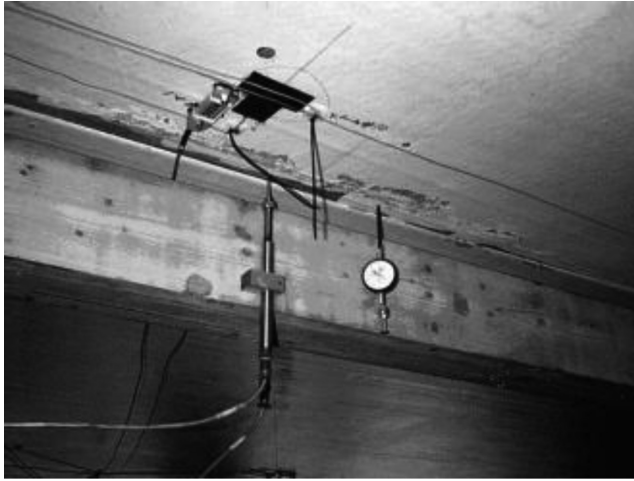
Strain gages, LVDT, and dial gages installed under an FRP slab bridge.
